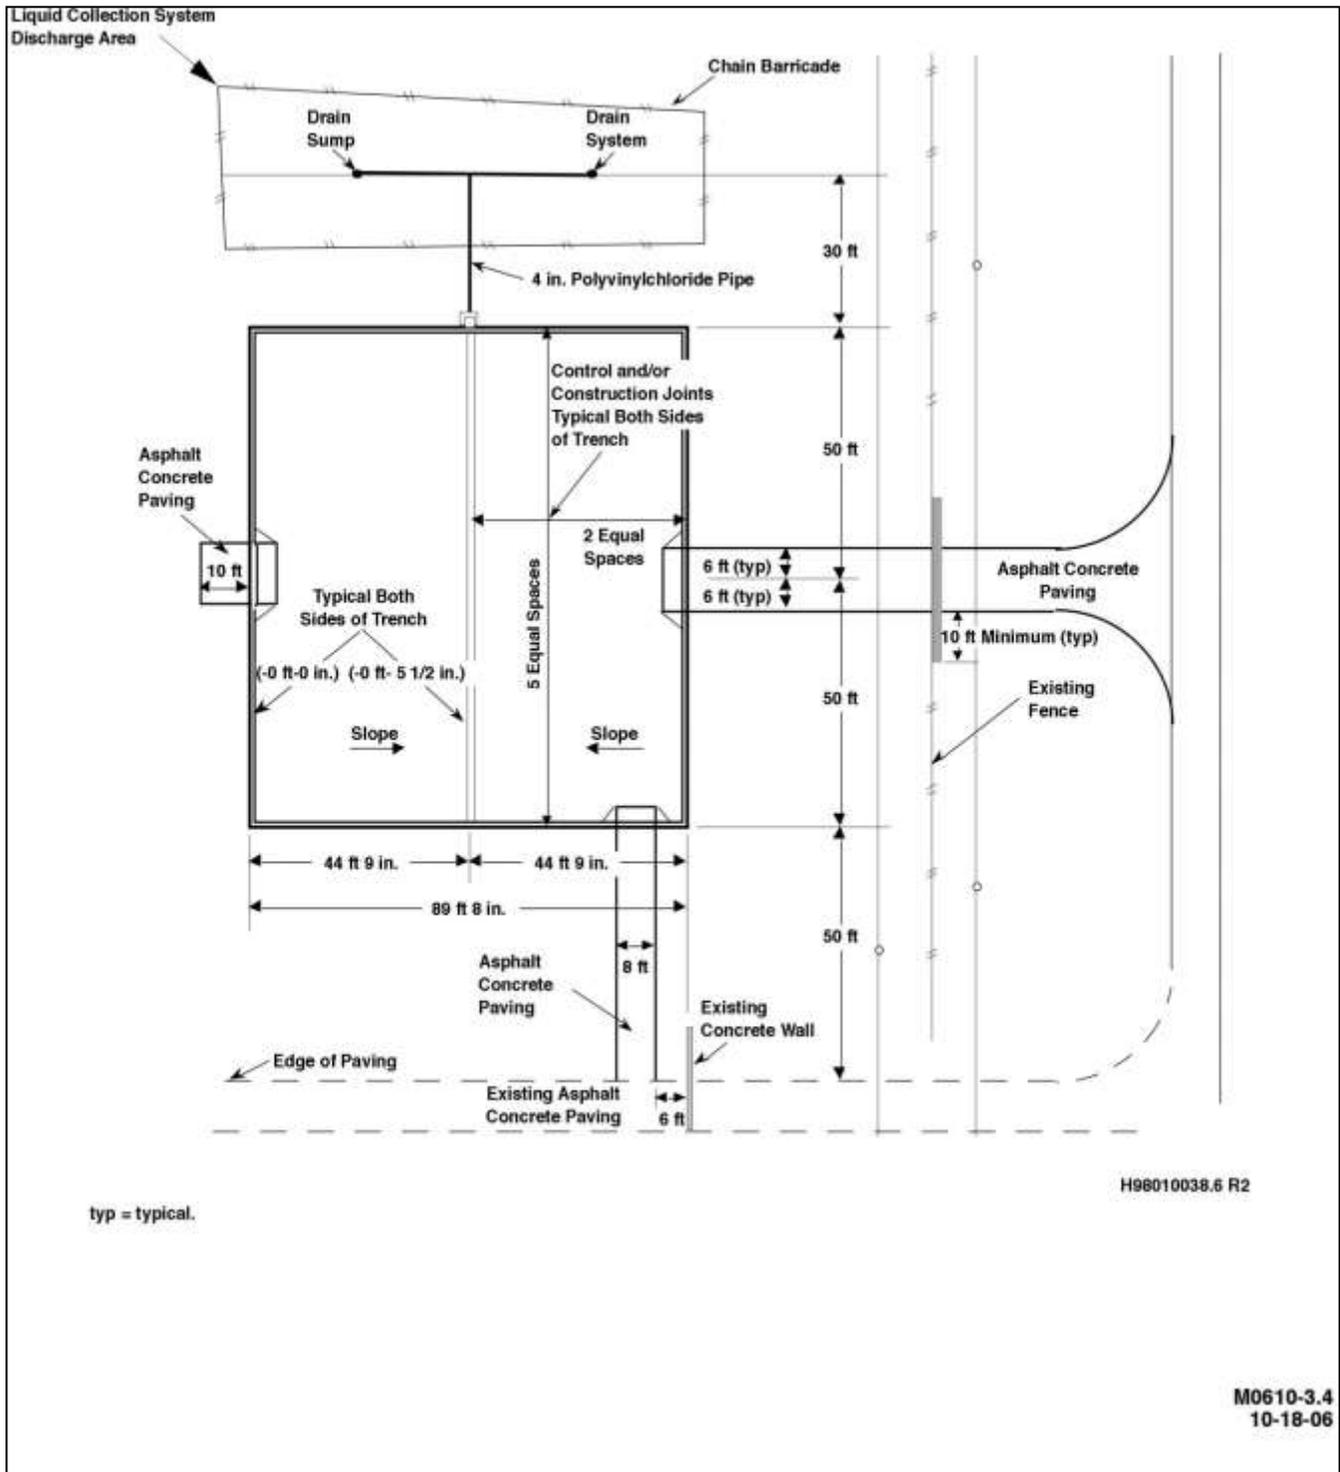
2402-W Series Waste Storage Buildings Layout
